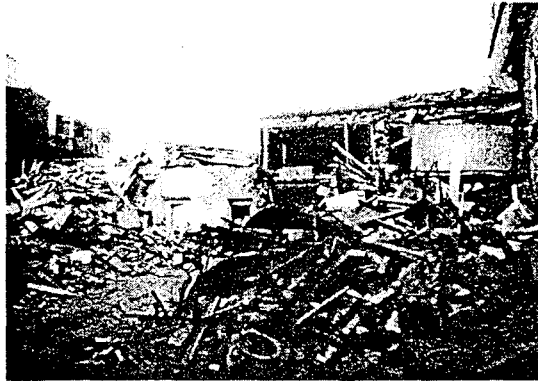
Damage of sundried brick structure (Tungshih, Taichung County)
